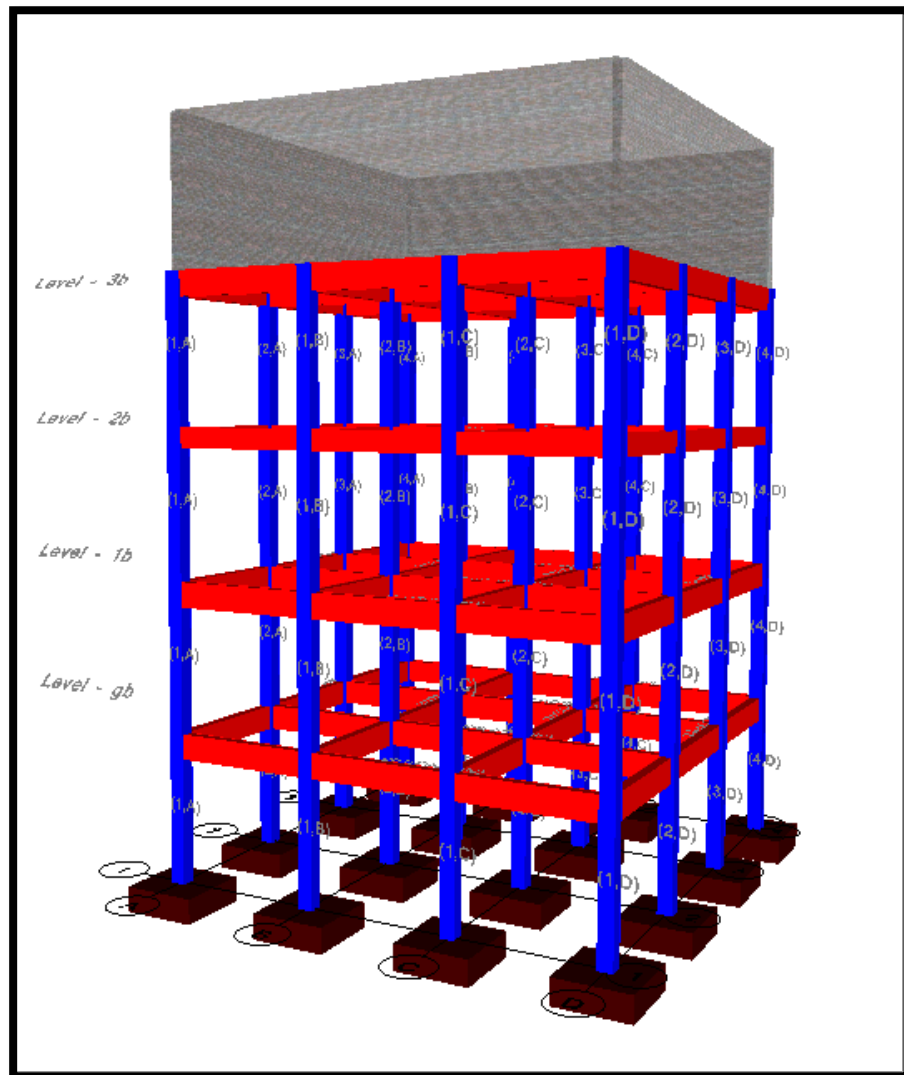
Three dimensional drawing of 4 storeys elevated RC water tank model
